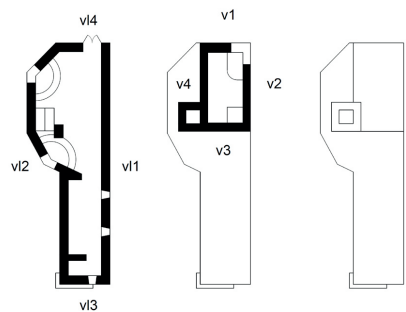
Prajjet, Mellieha Beach Post, degradation of concrete, plans and elevations of the structure.
